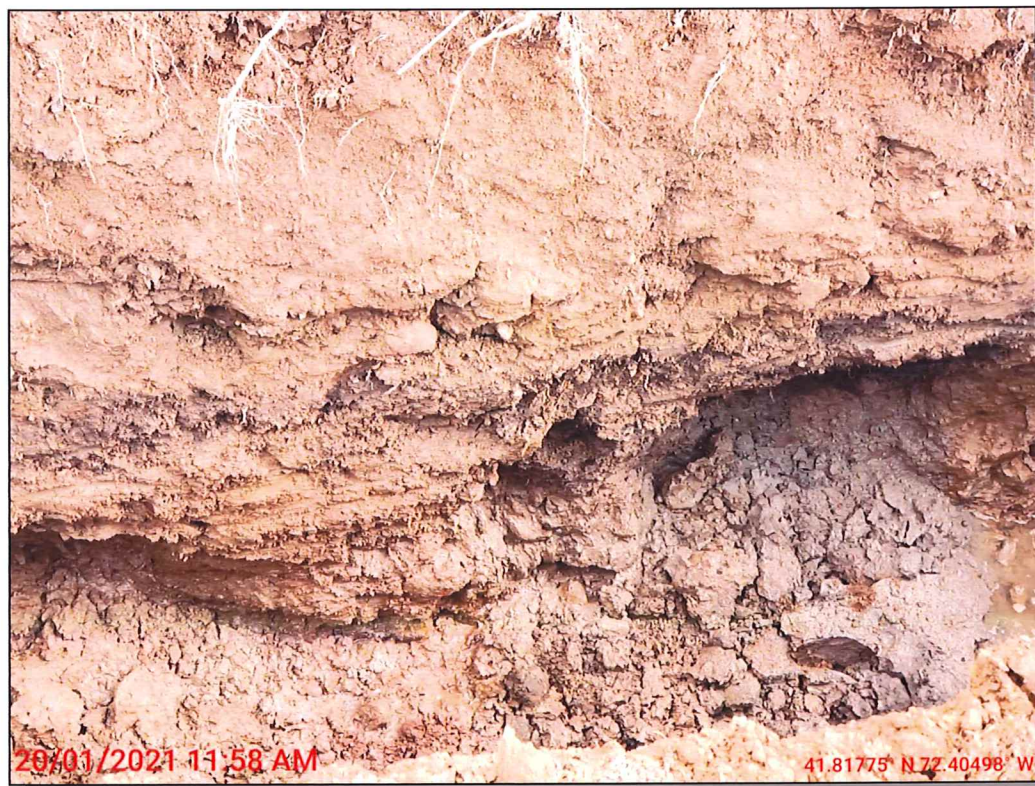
Soil Test Pit #2; showing dense saturated till (gray)
